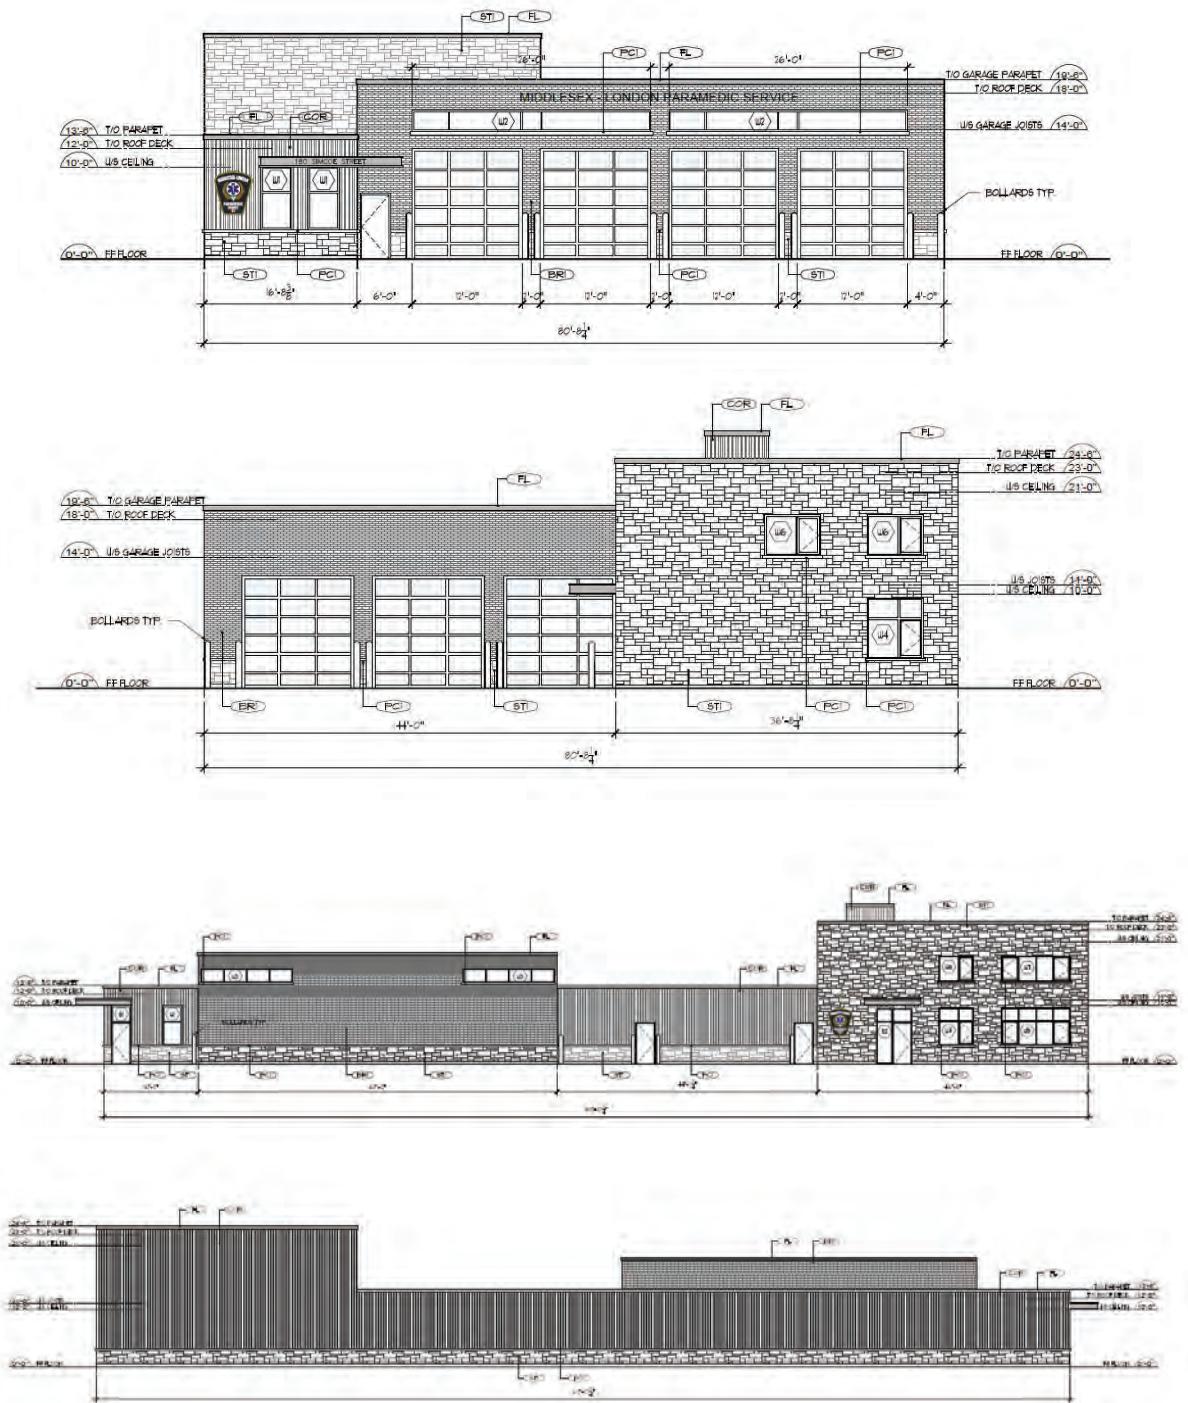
Architectural drawing of site plan (Source: Philip Agar Architect Inc., 2022)
